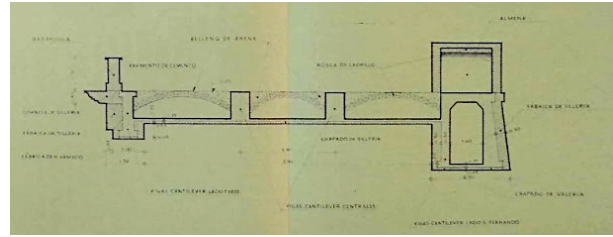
Section through the keystone of the central arcade. Formation of upper-level brickwork arches and lower framework between cantilever beams. (Source: Municipal Historical Archive of Cadiz).
